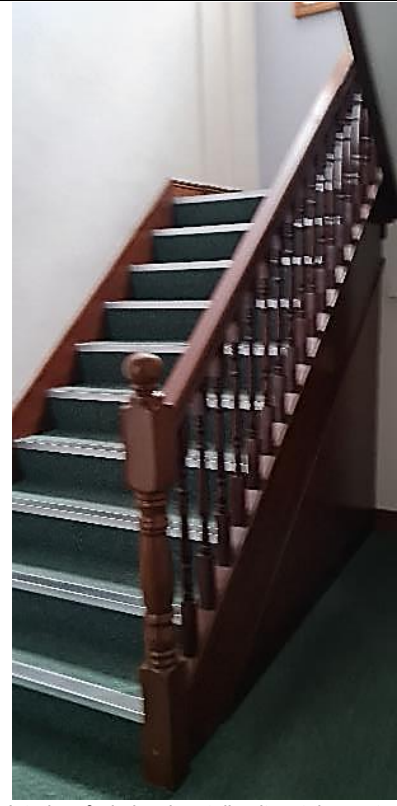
Interior of wholesale retail unit – staircase to first floor
